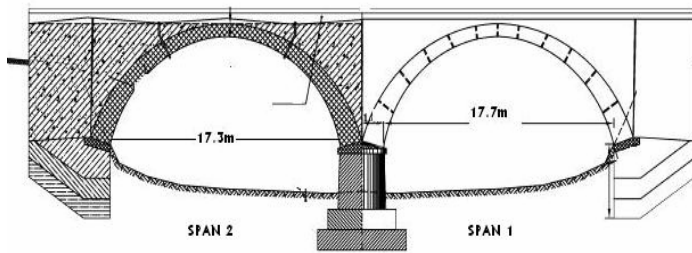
Schematic sketch of brick masonry arch bridge. (Left end: Kulem (K) end; Right end: Castle Rock (CR) end).
